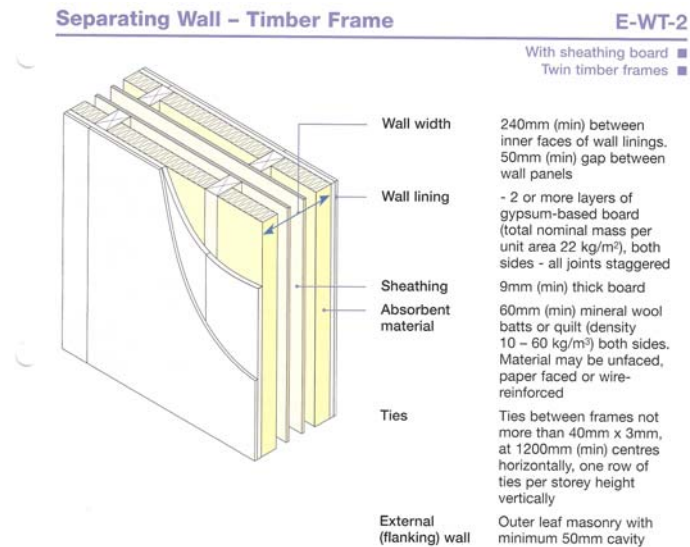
E-WT-2 Separating Wall Robust Detail (Robust Details Ltd 2009)
